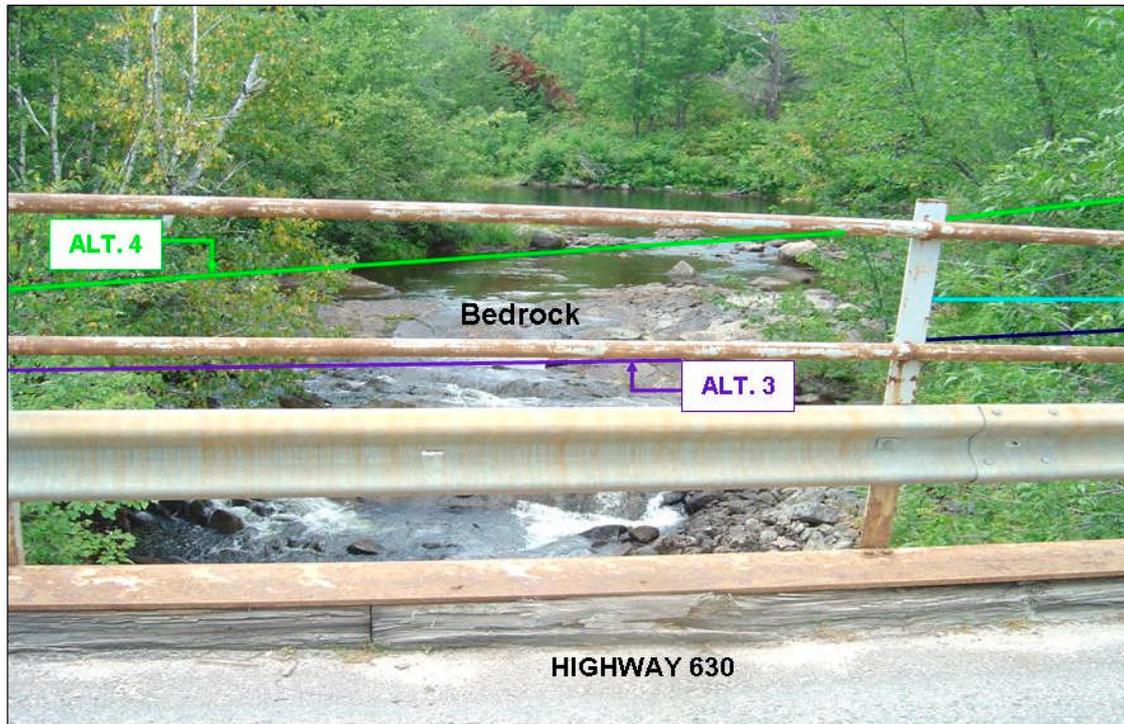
VIEW: Looking west from south bank of Amable-du-Fond River about 10 m downstream from north bridge structure. (August 17, 2006)
